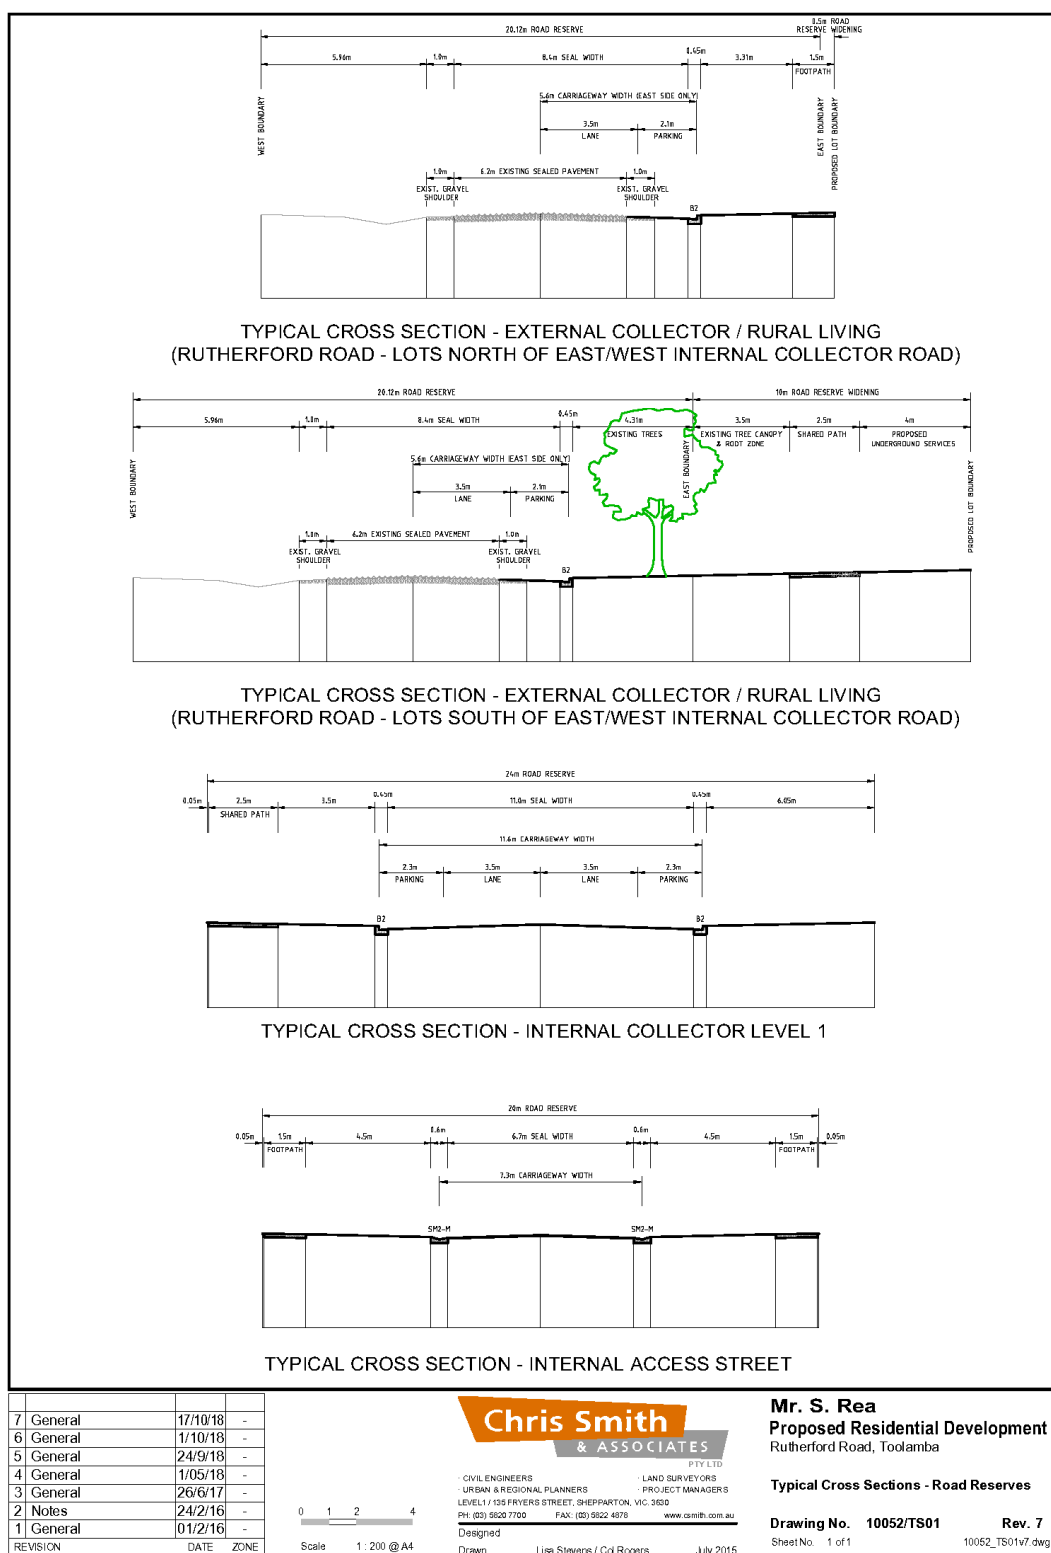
Typical Cross Sections – Road Reserve, from Toolamba Precinct Structure Plan 2018.
